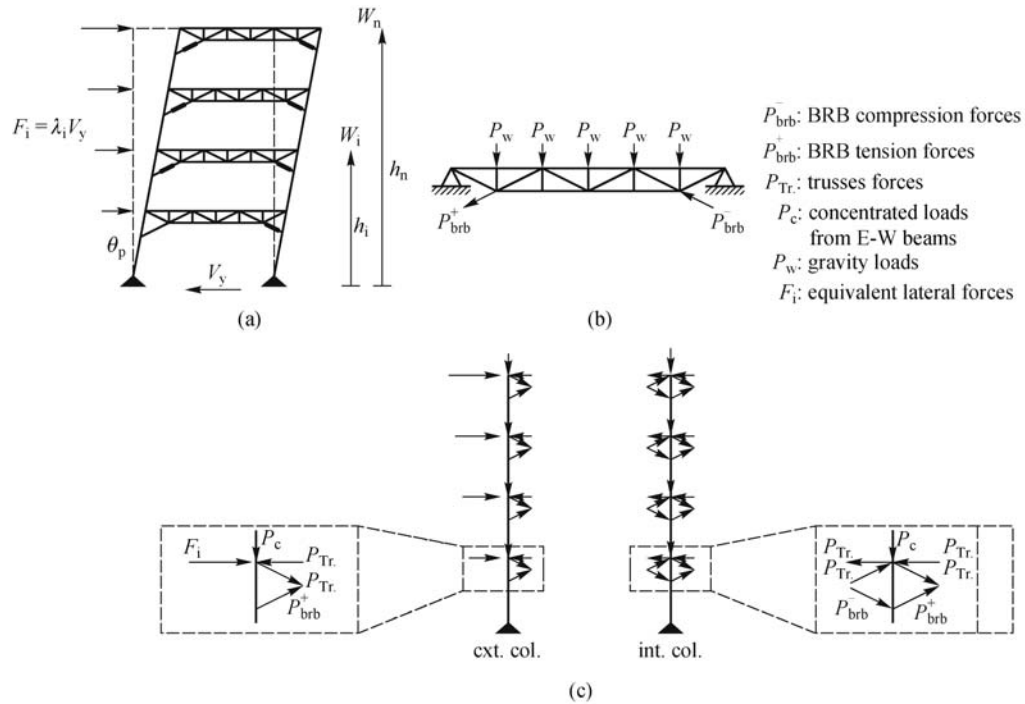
(a) Plastic mechanism; (b) truss capacity design; (c) column capacity design
